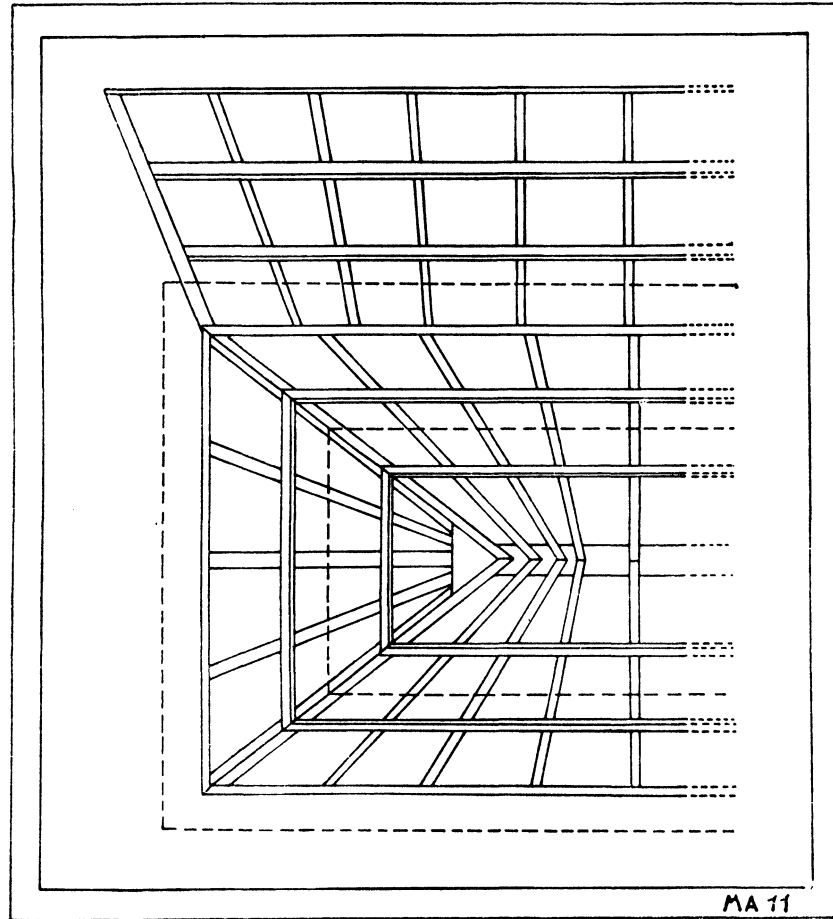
Reconstituted beamwork of the building shown in Prambanan Temple, north balustrade, north side, west panel : see figure 3 (MA11).
